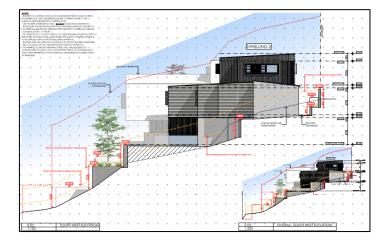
Extract from plans DA-301 – Elevations - Dwelling 2 (Source: Plans, Shade)
